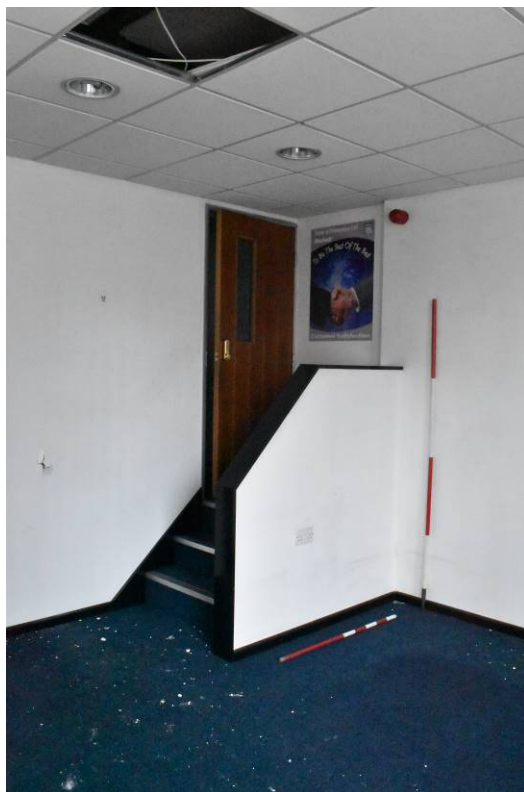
Entrance Hall [G1] looking north-west with base of modified stair A.
